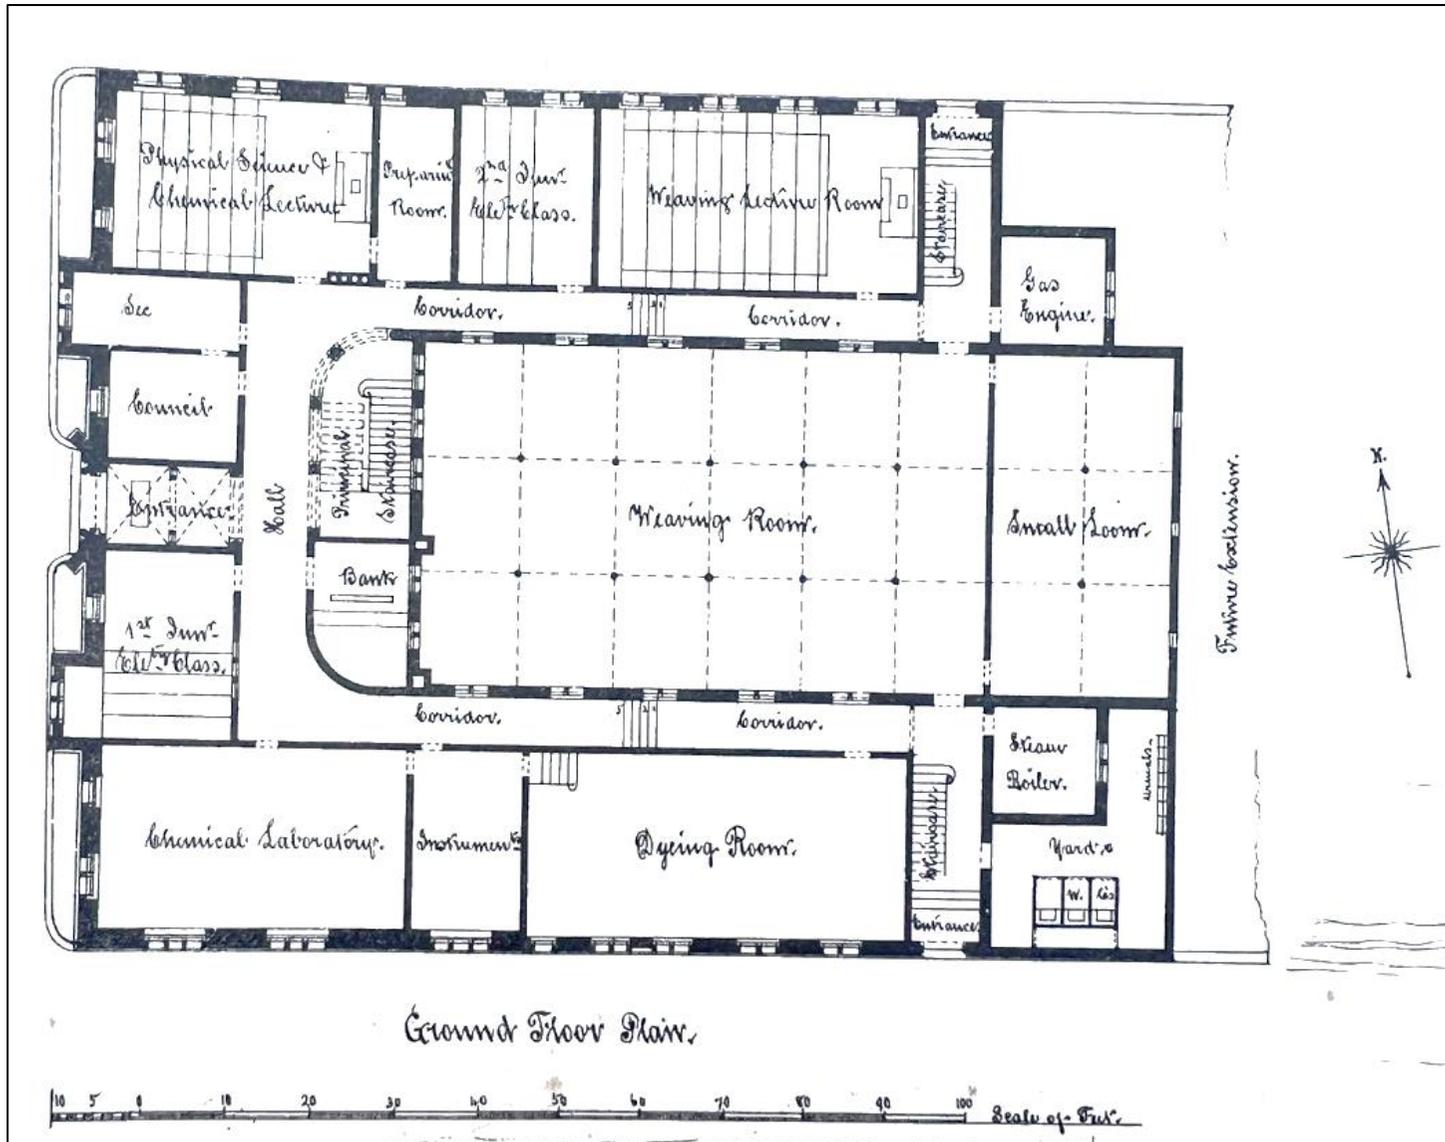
Ground Floor Plan extract from HUD/ET/1/4: Site plan: Technical school and Mechanics Institute, Hughes 1881
